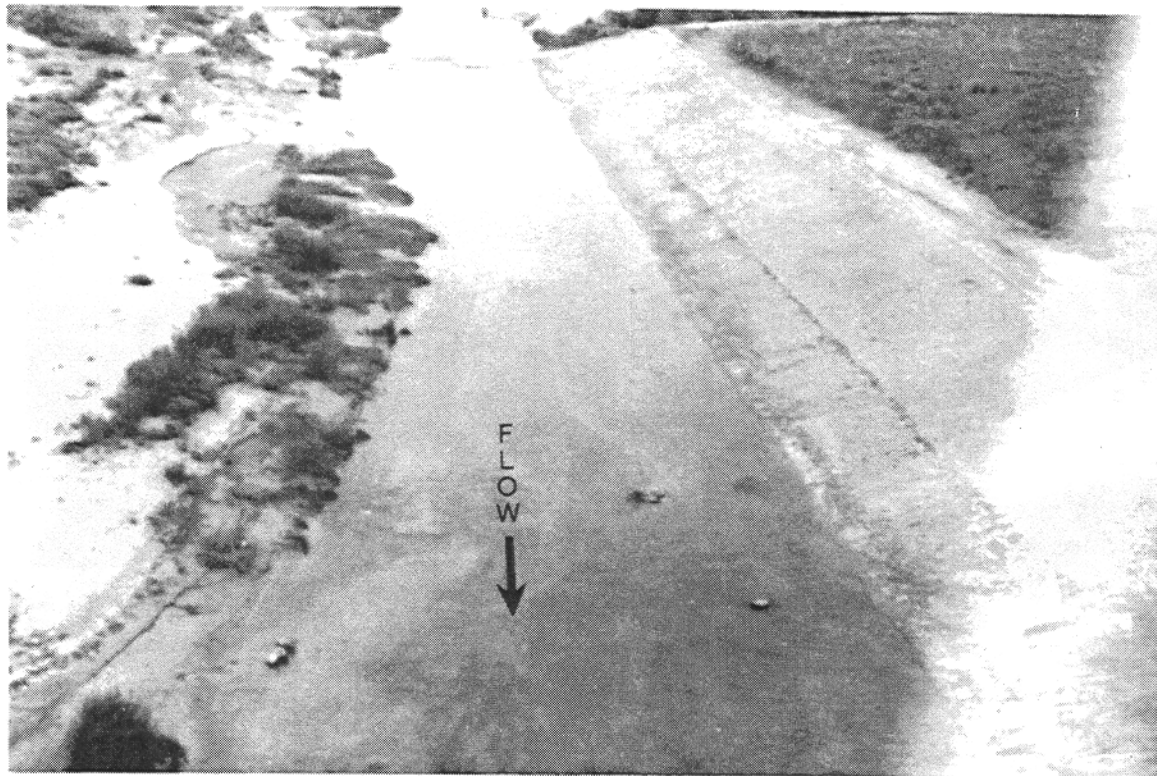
Los Angeles River: Approach Channel to Outlet Works, with portion of spillway approach to right (view toward upstream from bridge above outlet works).
